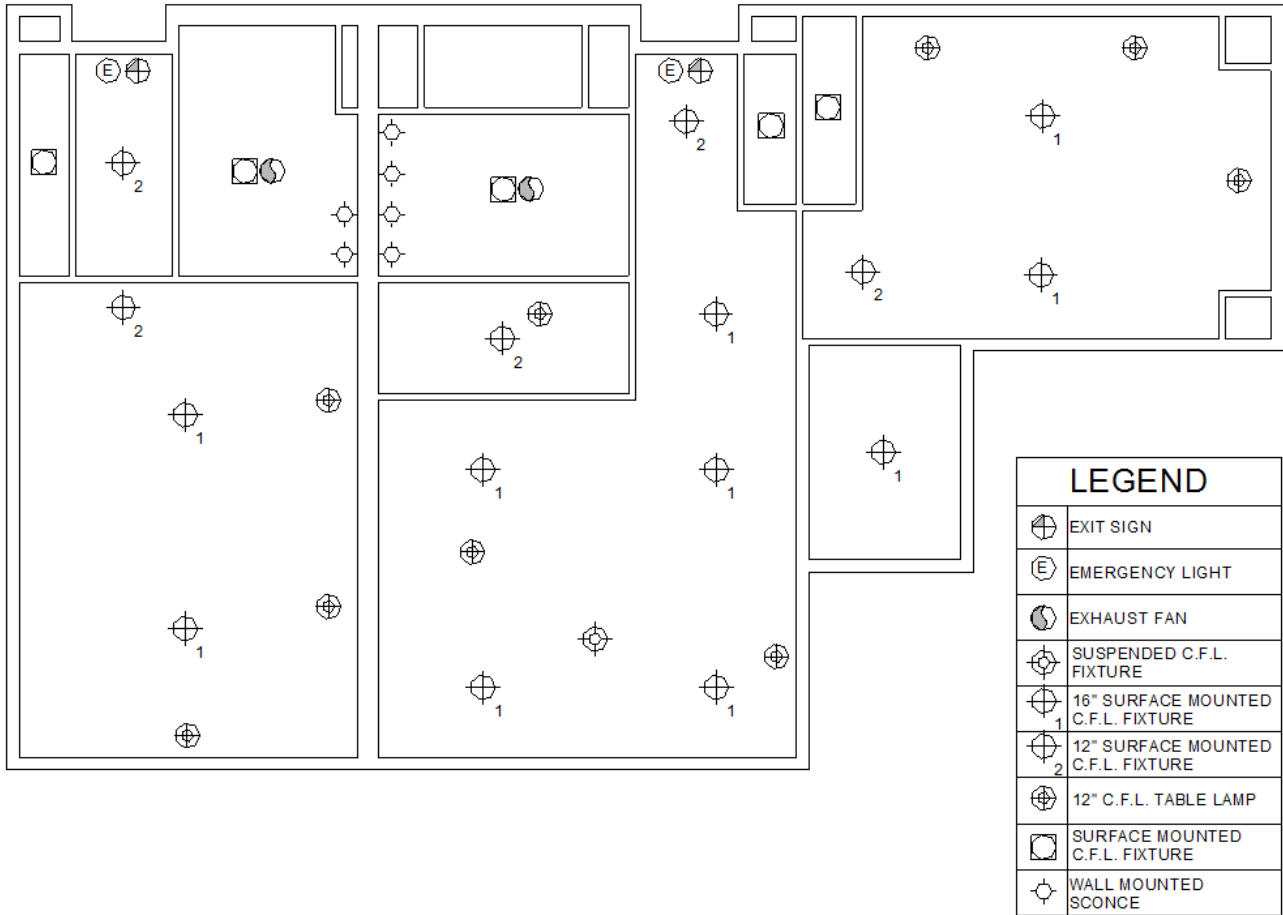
Reflected Ceiling and Lighting Plan and Legend
